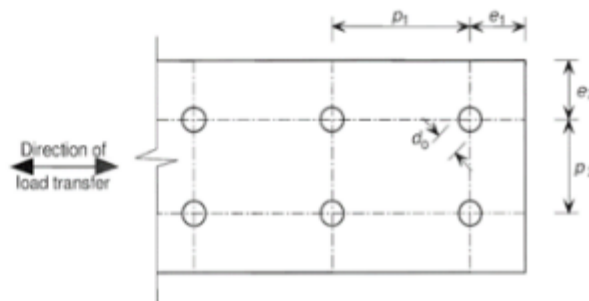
End distance, edge distance and spacings for fasteners and spot welds
